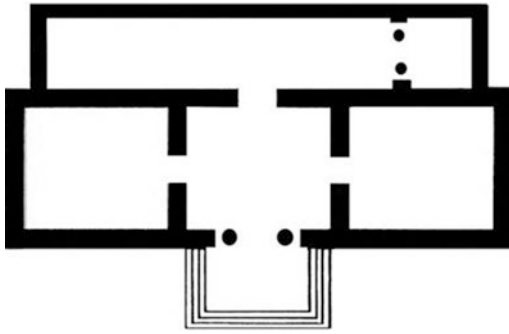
Khorsabad, Plan of "Bit-Hilani" (Parrot 1961: 223)
